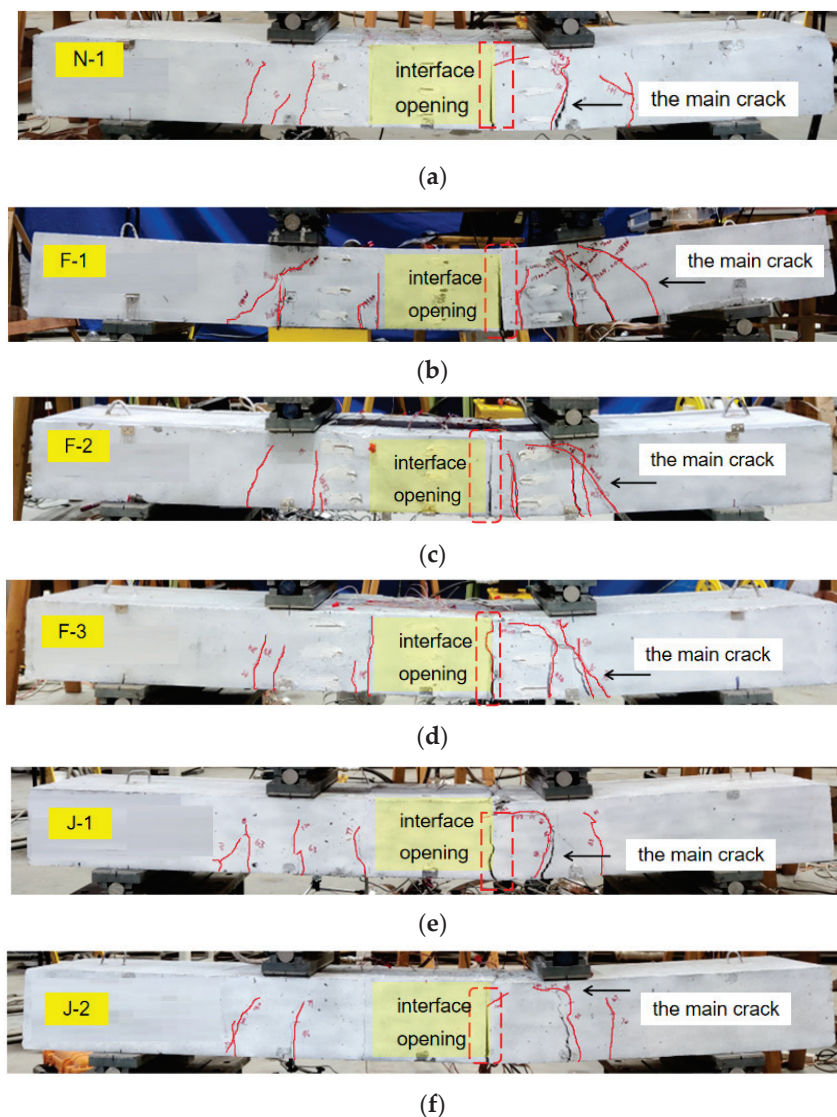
Failure model and crack pattern of the specimens. (a) Specimen N-1. (b) Specimen F-1. (c) Specimen F-2. (d) Specimen F-3. (e) Specimen J-1. (f) Specimen J-2.
